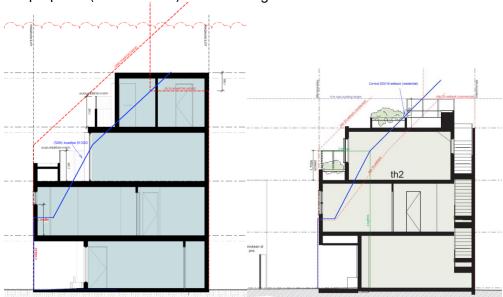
sectional diagrams showing indicative built form opposite No. 218 and 220 Mckean Street for TH13 of previous proposal under PLN19/0155 (section C-C on left hand side) and TH2 current proposal (Section A-A on right hand side).
